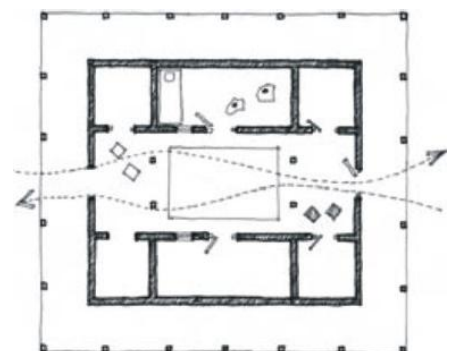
Plan of a typical courtyard dwelling in Sri Lanka illustrating how an air funnel would work (Source- Hyde: 2008, 328)
